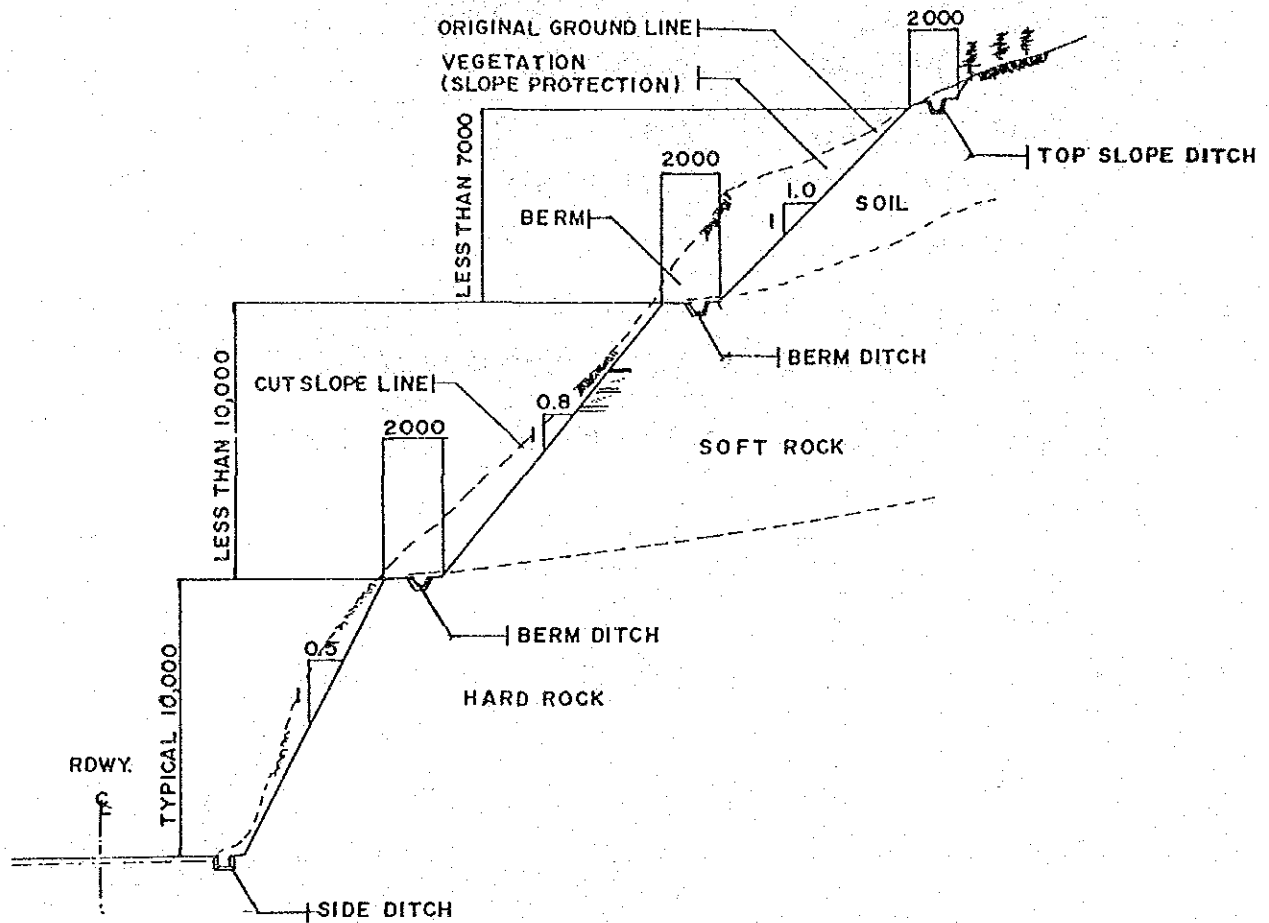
TYPICAL CROSS SECTION FOR CUT SLOPE
